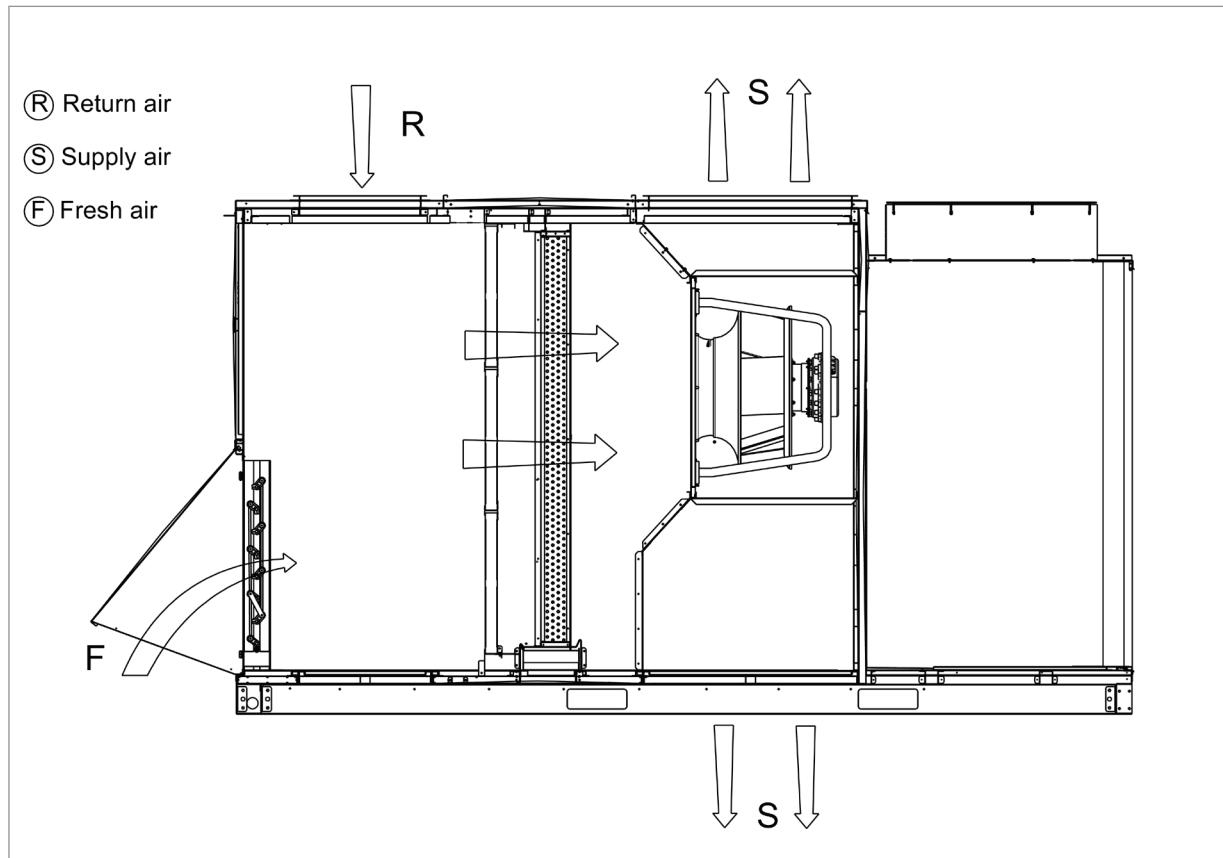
Manual outside air damper – Fresh air inlet from bottom side
